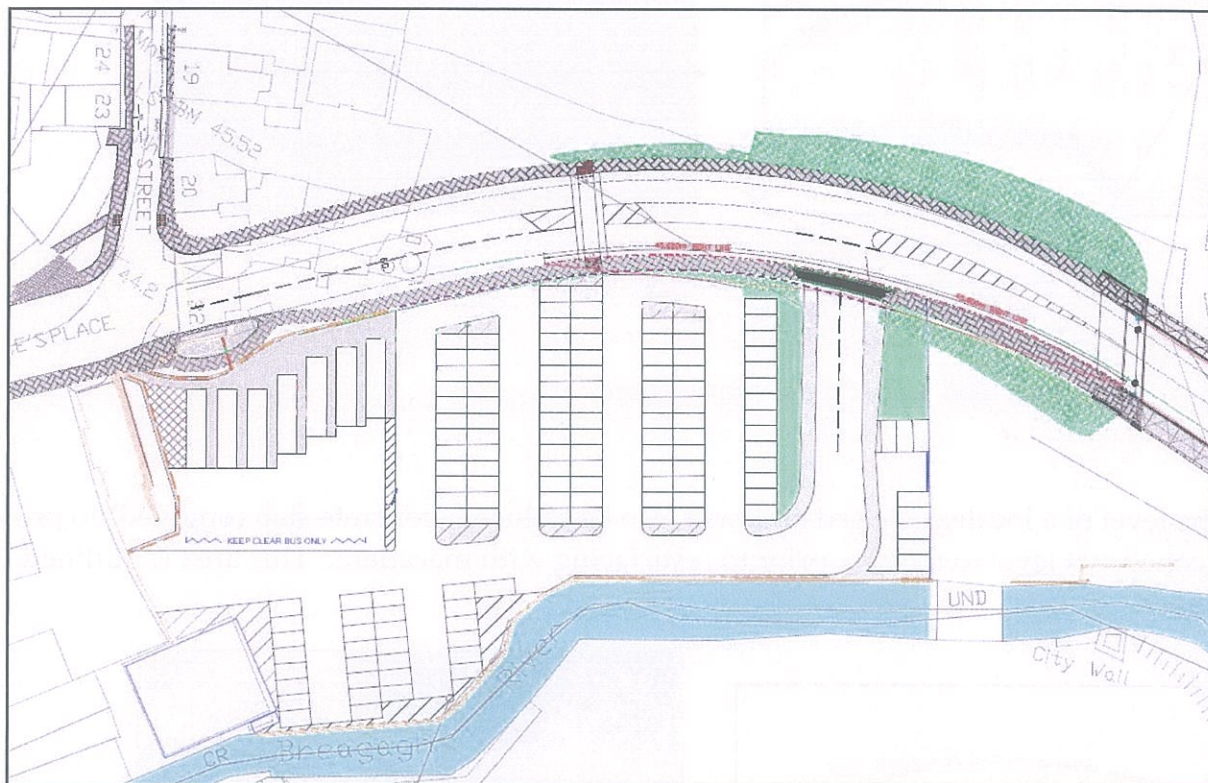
LAYOUT OF PROPOSED CAR/COACH PARK
